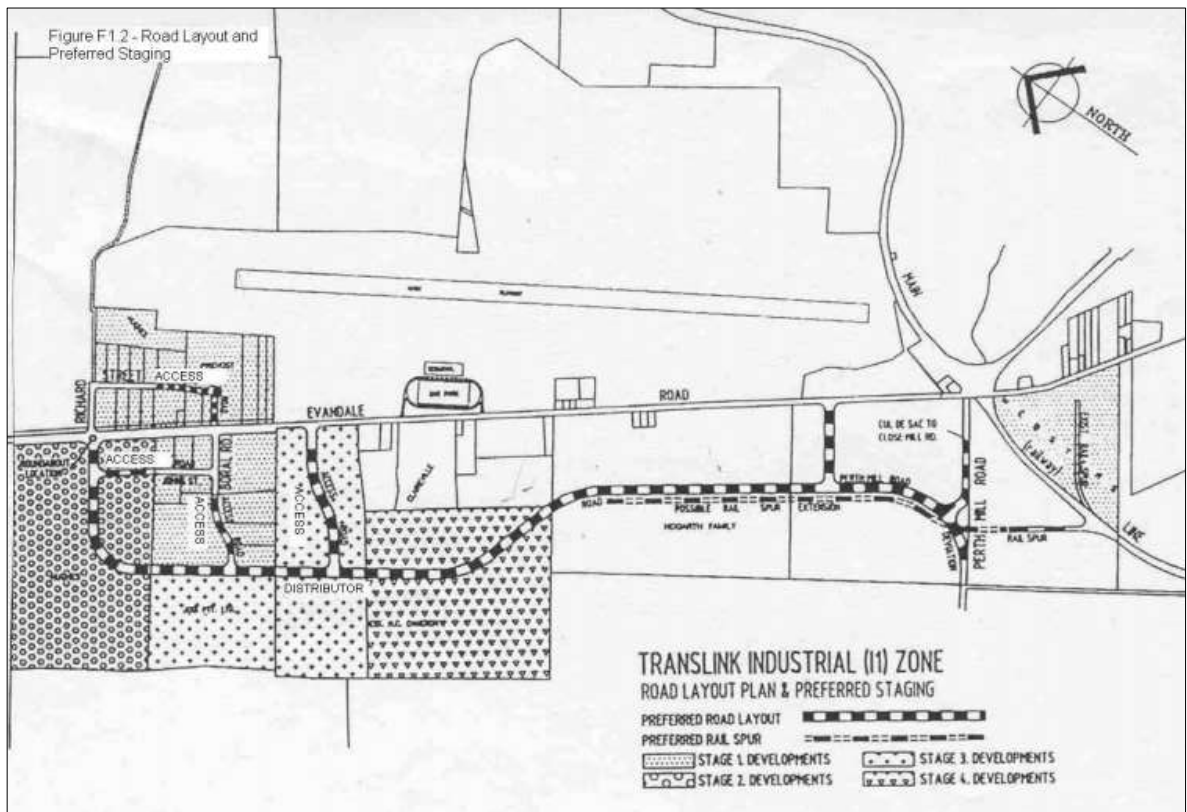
Road layout plan as required by clause NOR-S1.8.1
